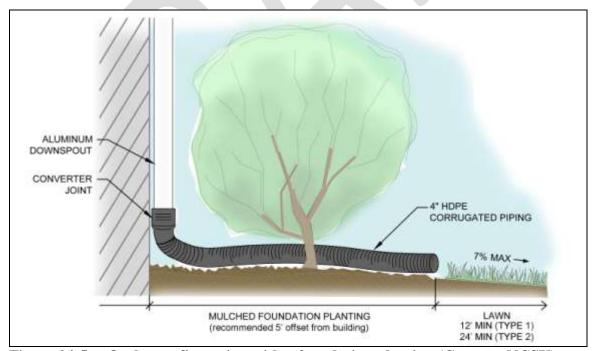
Outlet configuration with a foundation planting (Carmen, NCSU)
